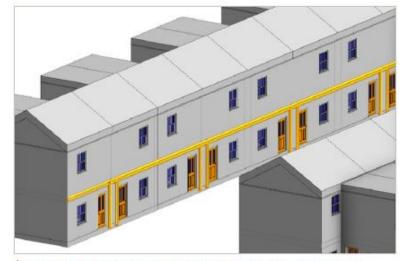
Figure J: Typical arrangement of external wall pipe on front elevation about doorways with entry at ground floor level
